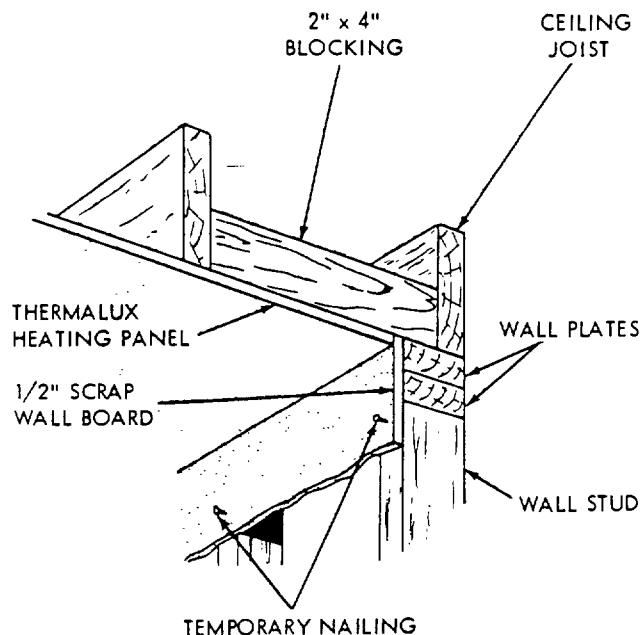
Isolating Heating Panel which Abuts a Wall
